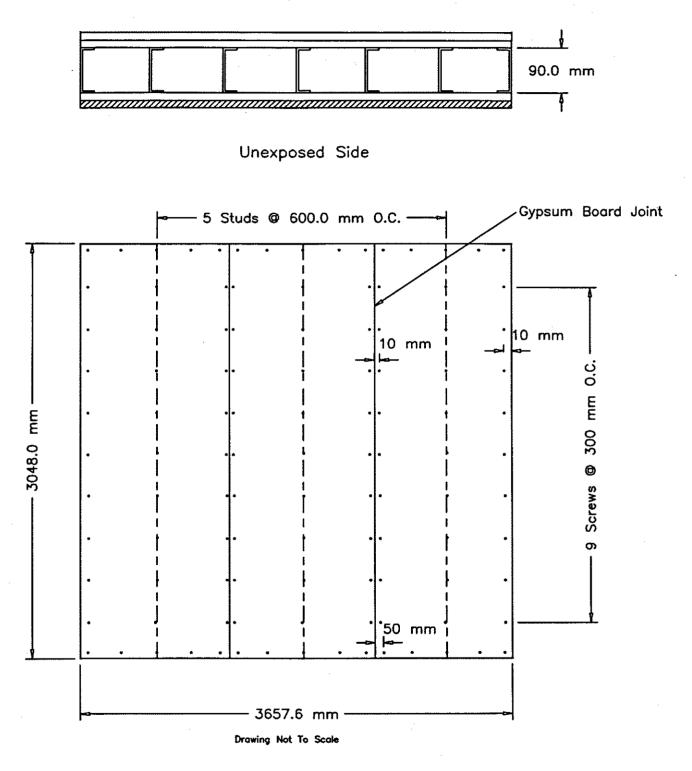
Screw Locations For Wood Stud (600 mm O.C.), 2x2 Gypsum Board Layers, Full-Scale Assembly, Base Layer Gypsum Board, Unexposed Face
